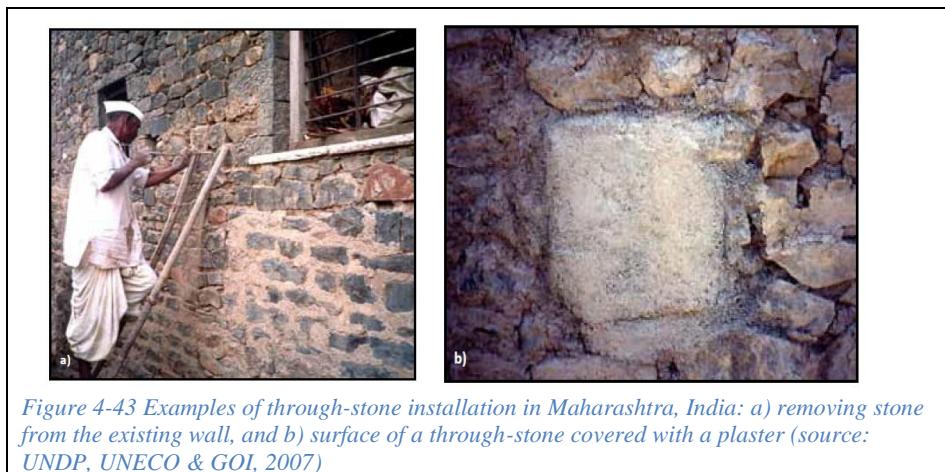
Examples of through-stone installation in Maharashtra, India: a) removing stone from the existing wall, and b) surface of a through-stone covered with a plaster (source: UNDP, UNECO & GOI, 2007)
